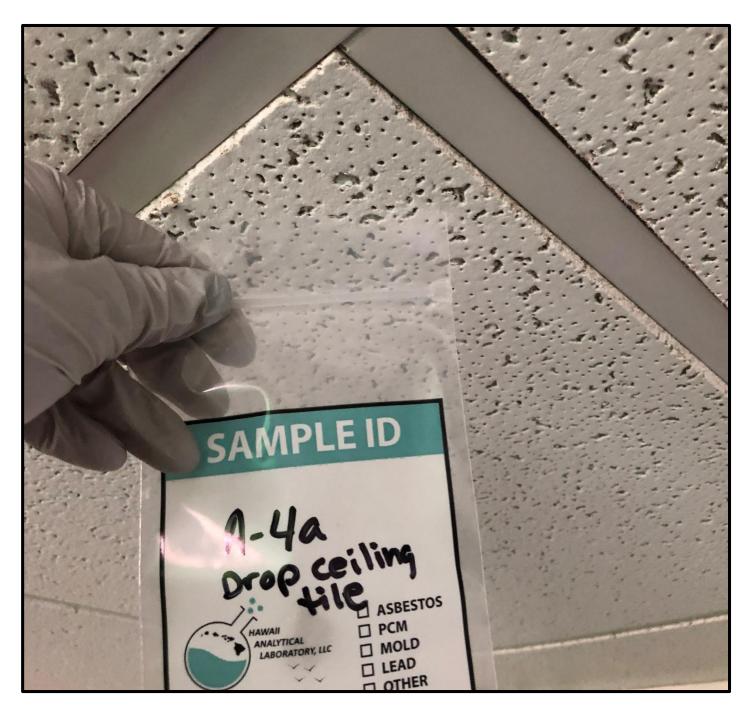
Sample A-4a Drop Ceiling Tile, Annex C
